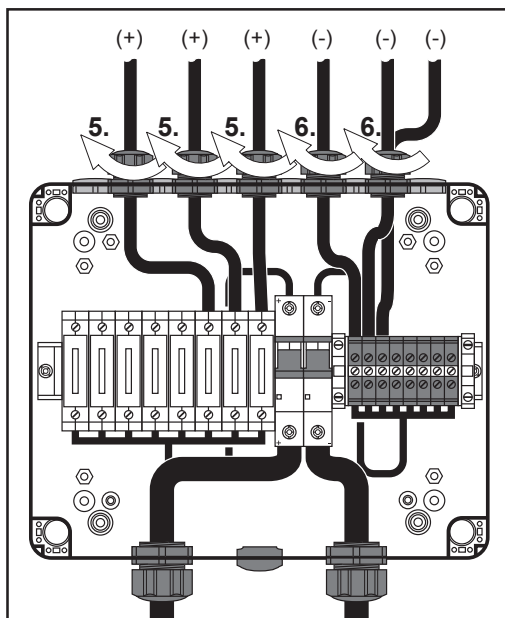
Fixing the solar module string-cables to the DC isolating box 40/60 using strain relief devices
